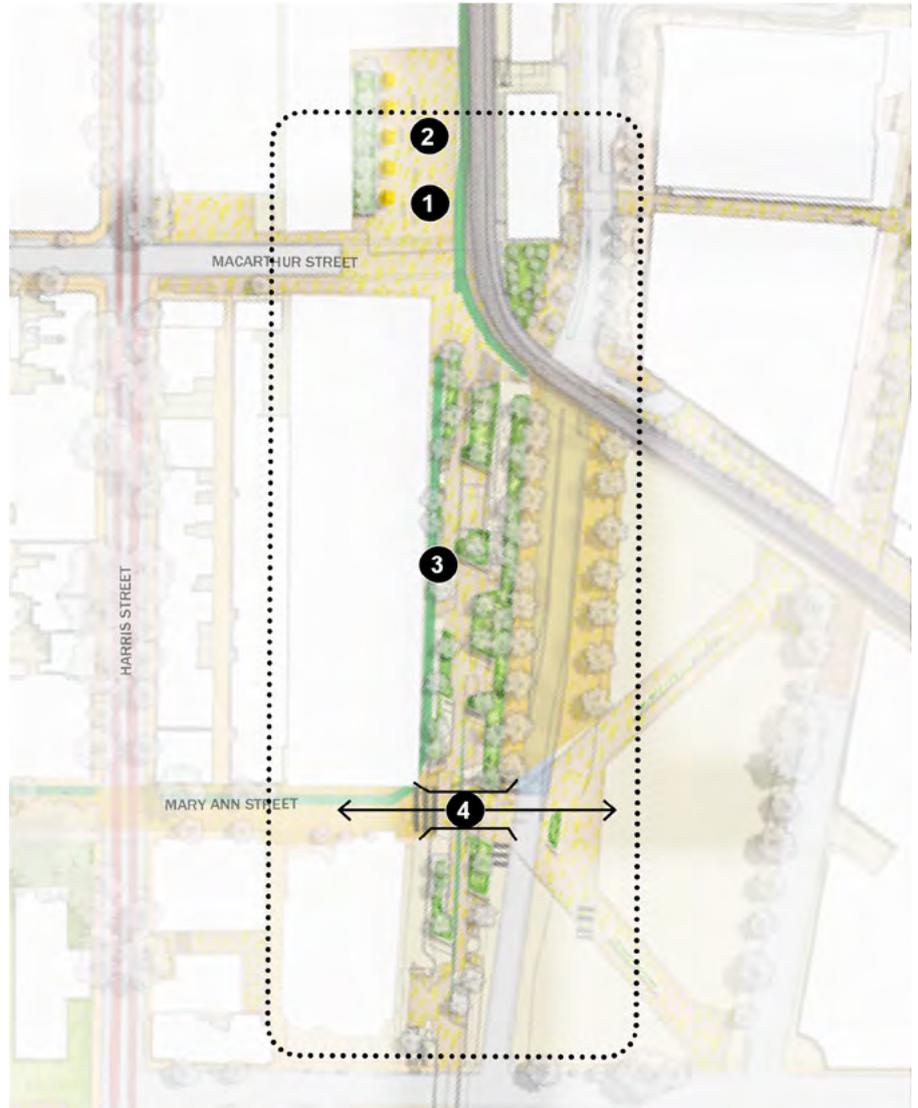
/ Plan of Goods Line North Character Area (Hassell)
